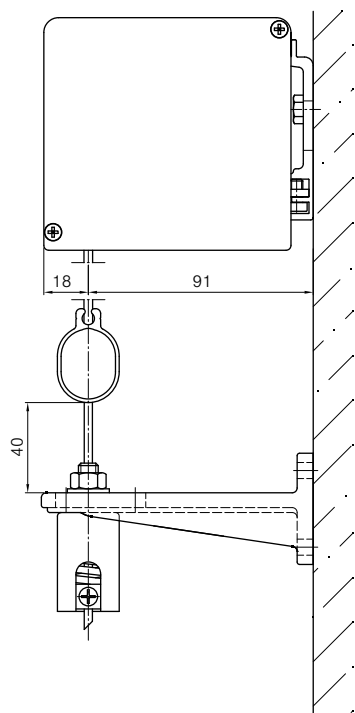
Standard model vertical awning 490 with guide cables, crank drive
